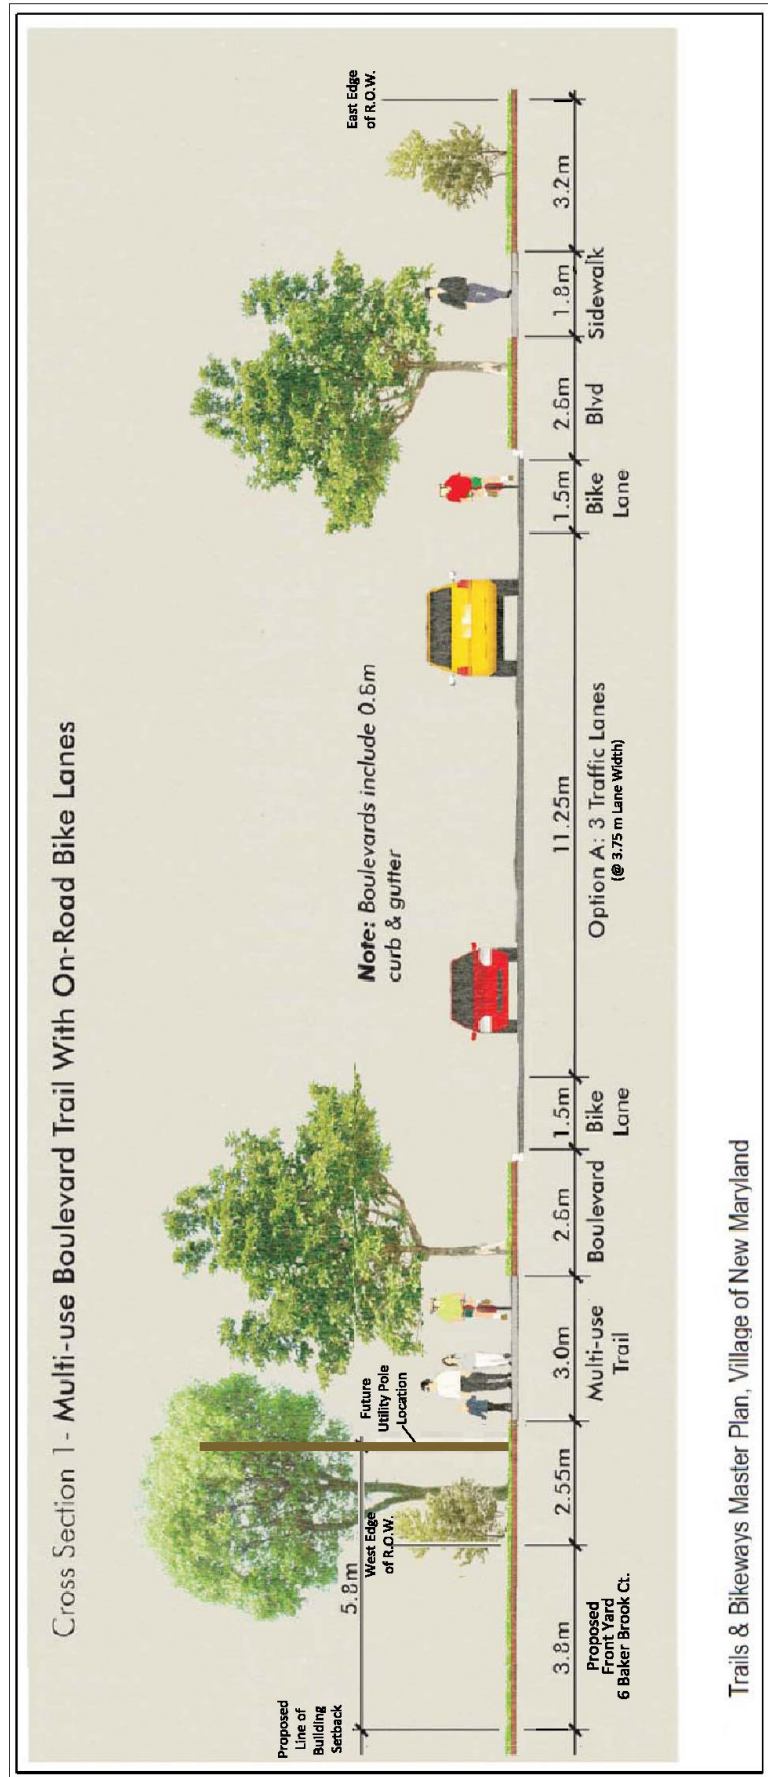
Cross Section – Proposed Multi-Use Trail along Edge of New Maryland Highway
